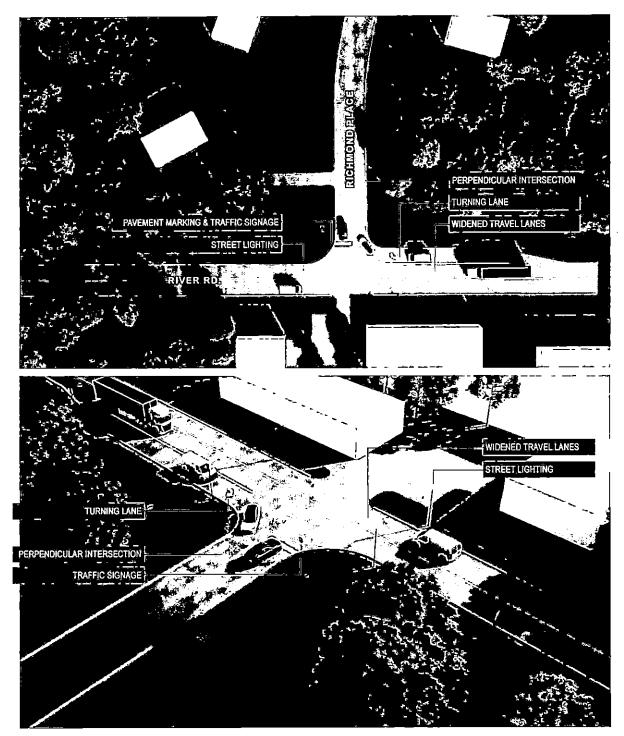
River Road proposed conditions, plan view & axonimetric view above. Proposed improvements to include:
